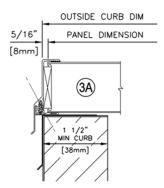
TYPICAL PANEL INSTALLATION—SKYLIGHT
